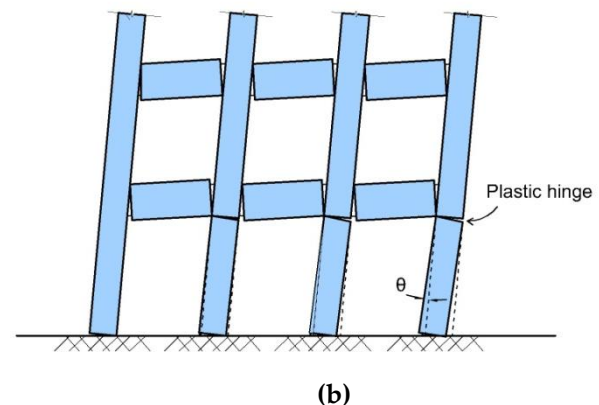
(b) Damage to column caused by frame elongation (Pampanin, 2010).
